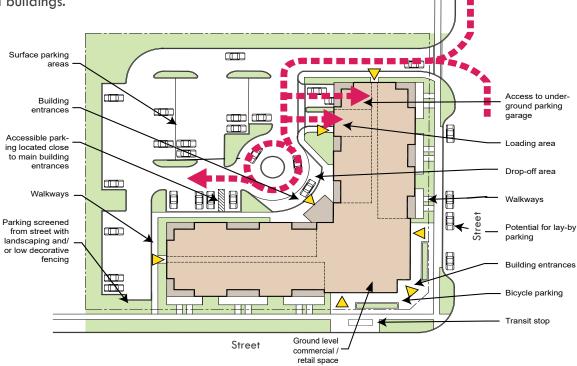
Conceptual Demonstration Plan For Mixed Use/Apartment Building
